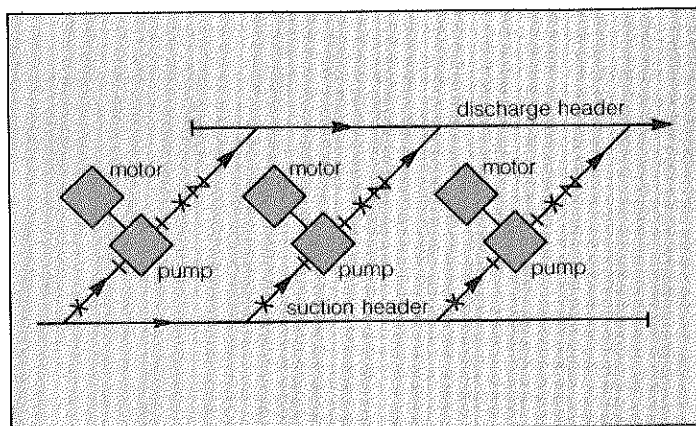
Acceptable station piping arrangement for large water pump installations.
